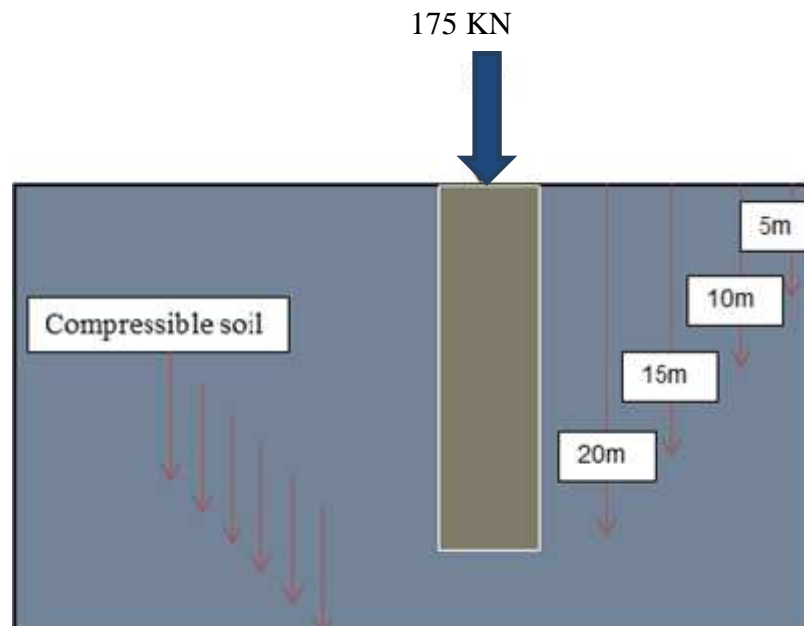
Concrete drill shaft foundations on compressible soil with different pile length
